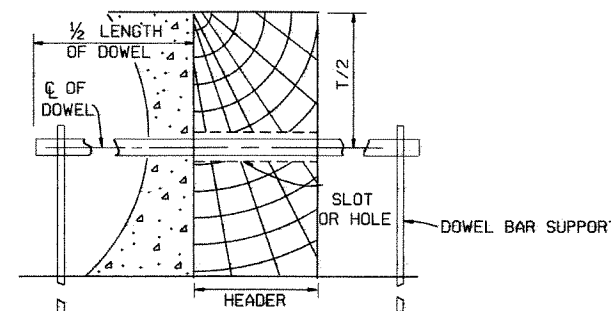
DETAIL OF JOINT SUPPORT FOR EXPANSION JOINTS
